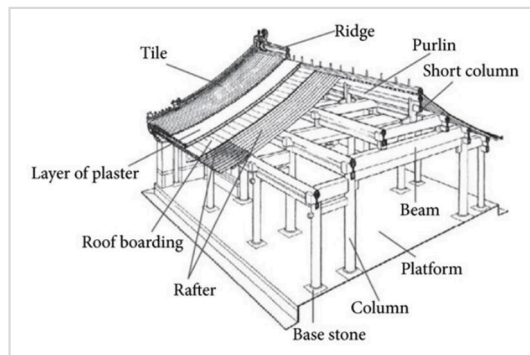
Traditional Chuan-Dou style wooden structure folk house in Southwest China
